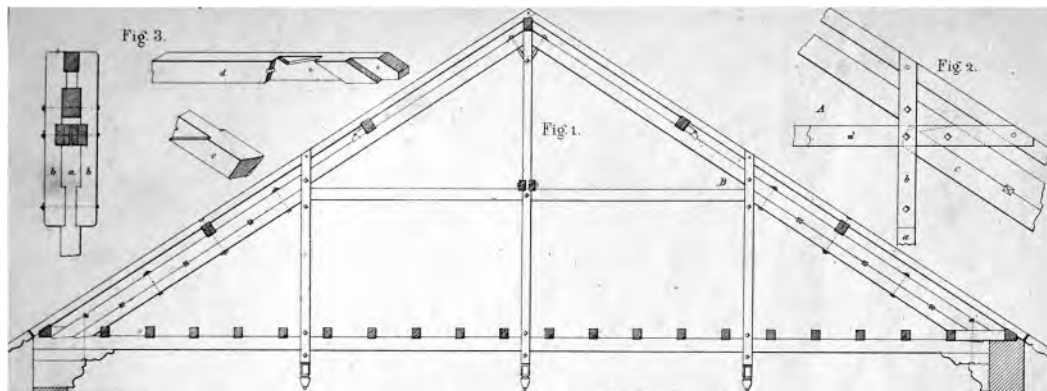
Construction plan for a roof truss with a span of up to 24m (Breyman 1851: plate 33, Figure 1).
